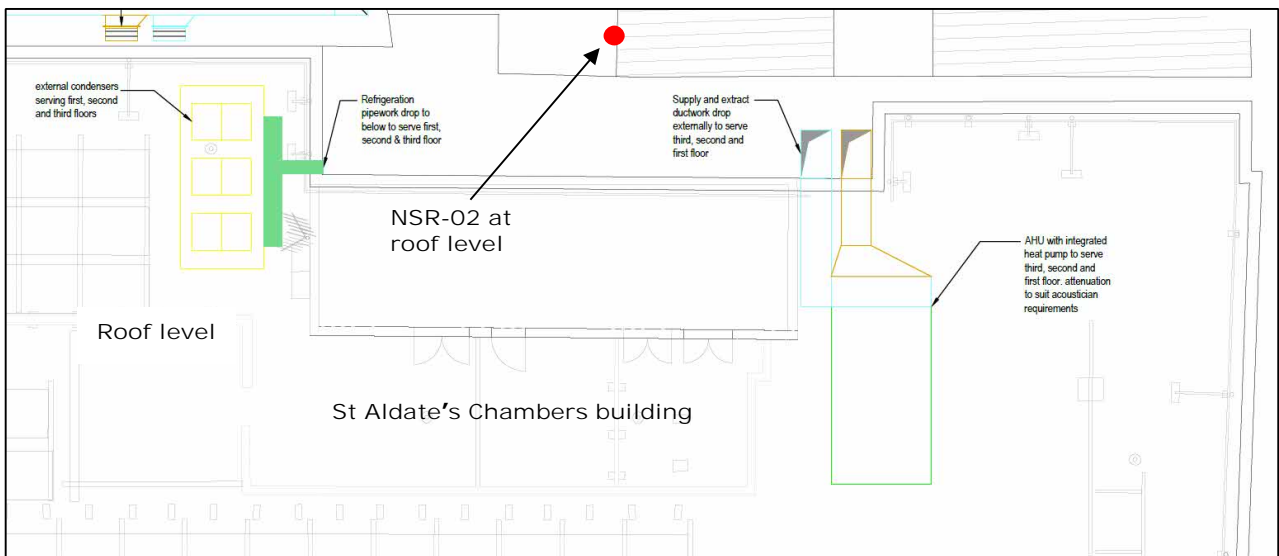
Locations of External Mechanical Services Equipment and NSR at roof level
